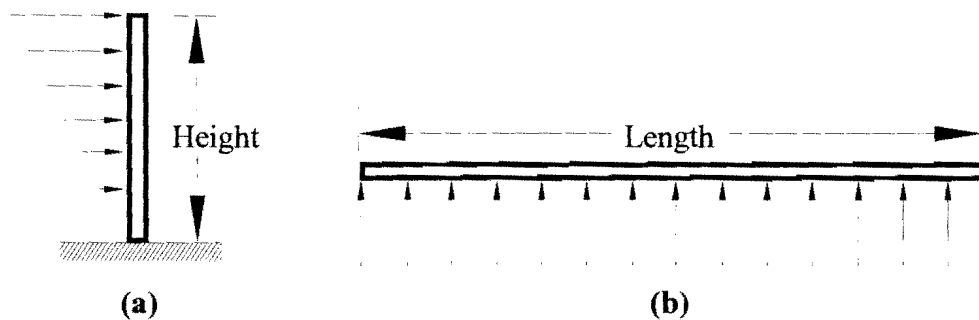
Assumed Wind Pressure Distribution on Soundwall: (a) Elevation View; and (b) Plan View
